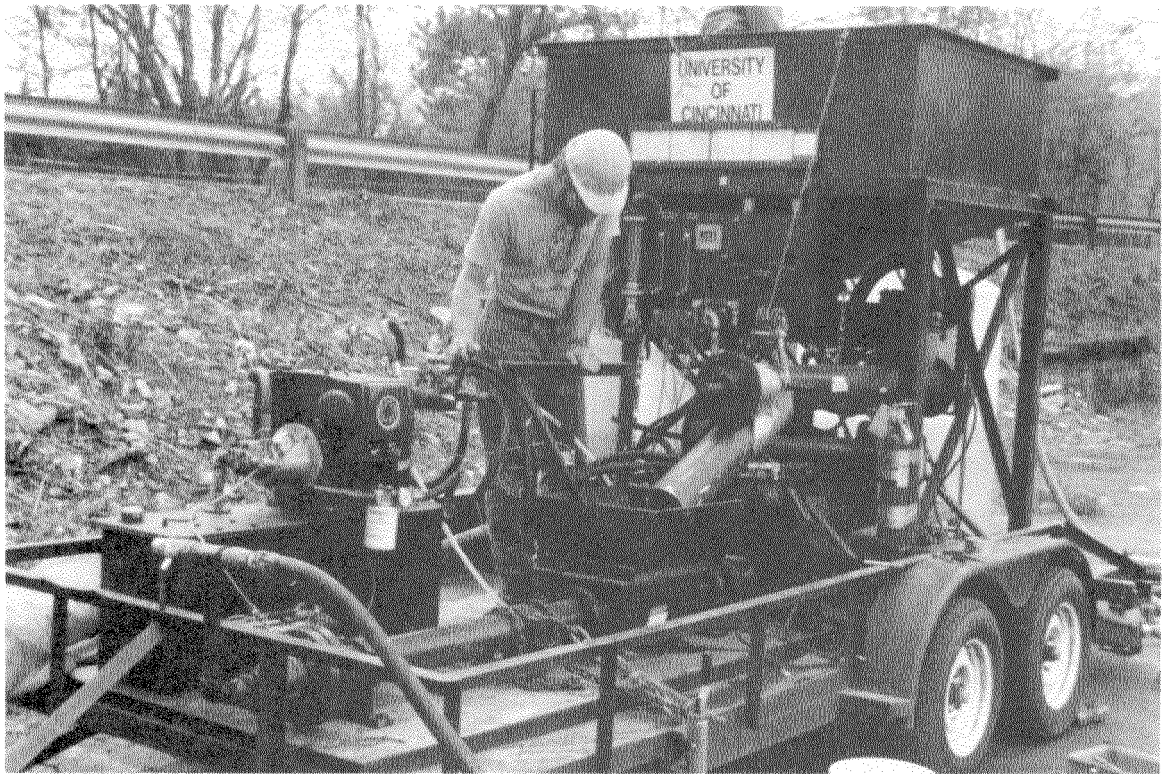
Slurry Mixing and Pumping Equipment Mounted on Trailers
